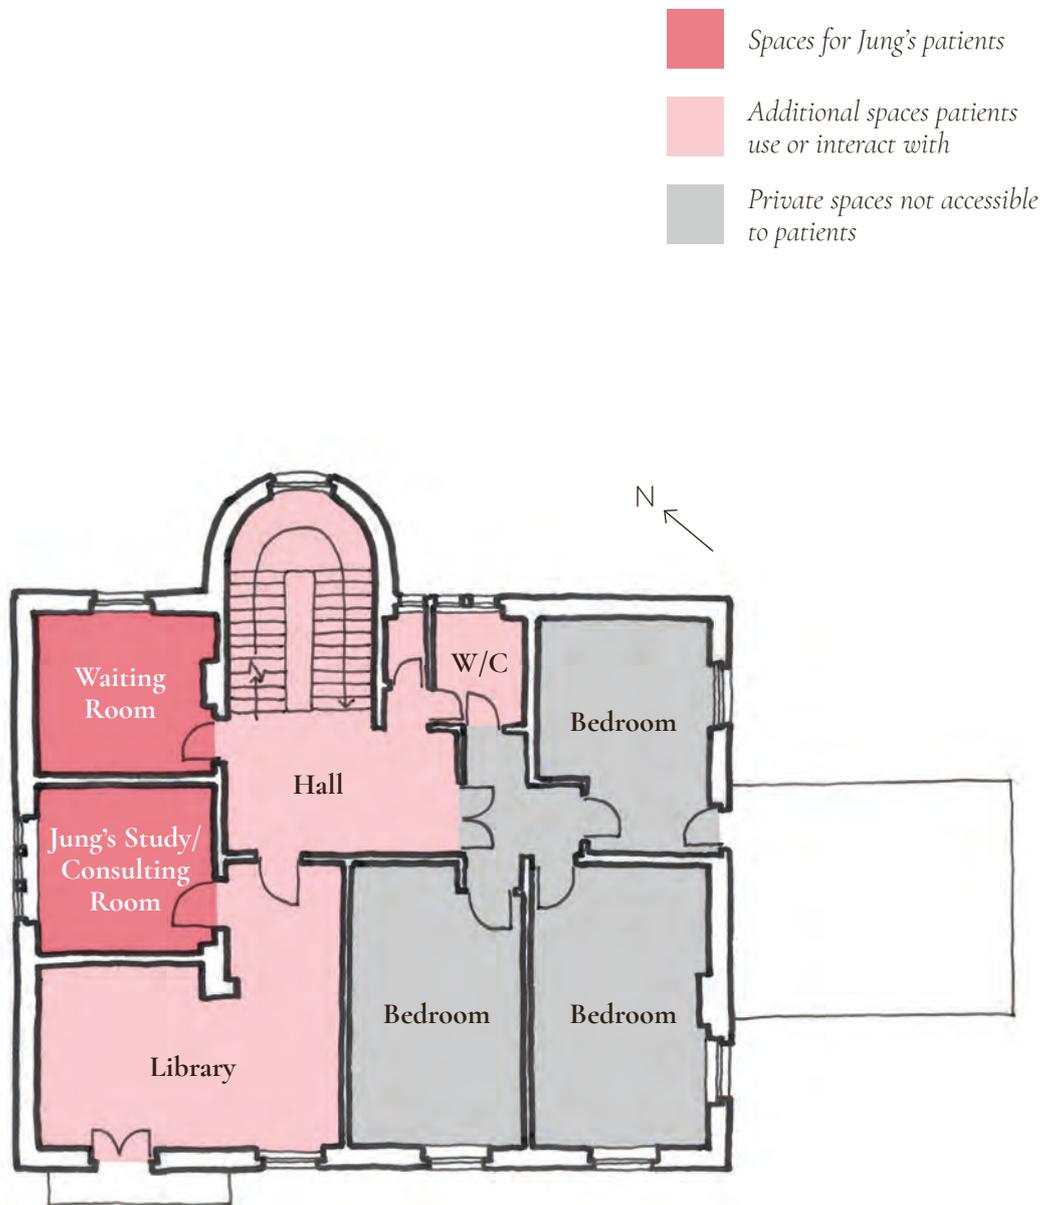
First floor plan sketch of 228 Seestrass in Küsnacht showing Jung's consulting room opposite the family's bedrooms.
